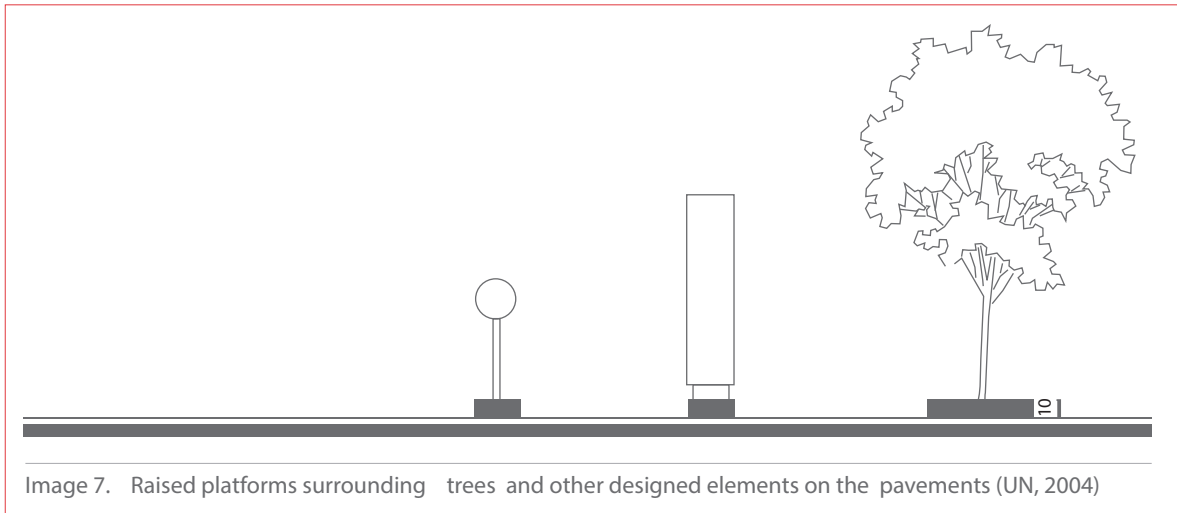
Raised platforms surrounding trees and other designed elements on the pavements (UN, 2004)
